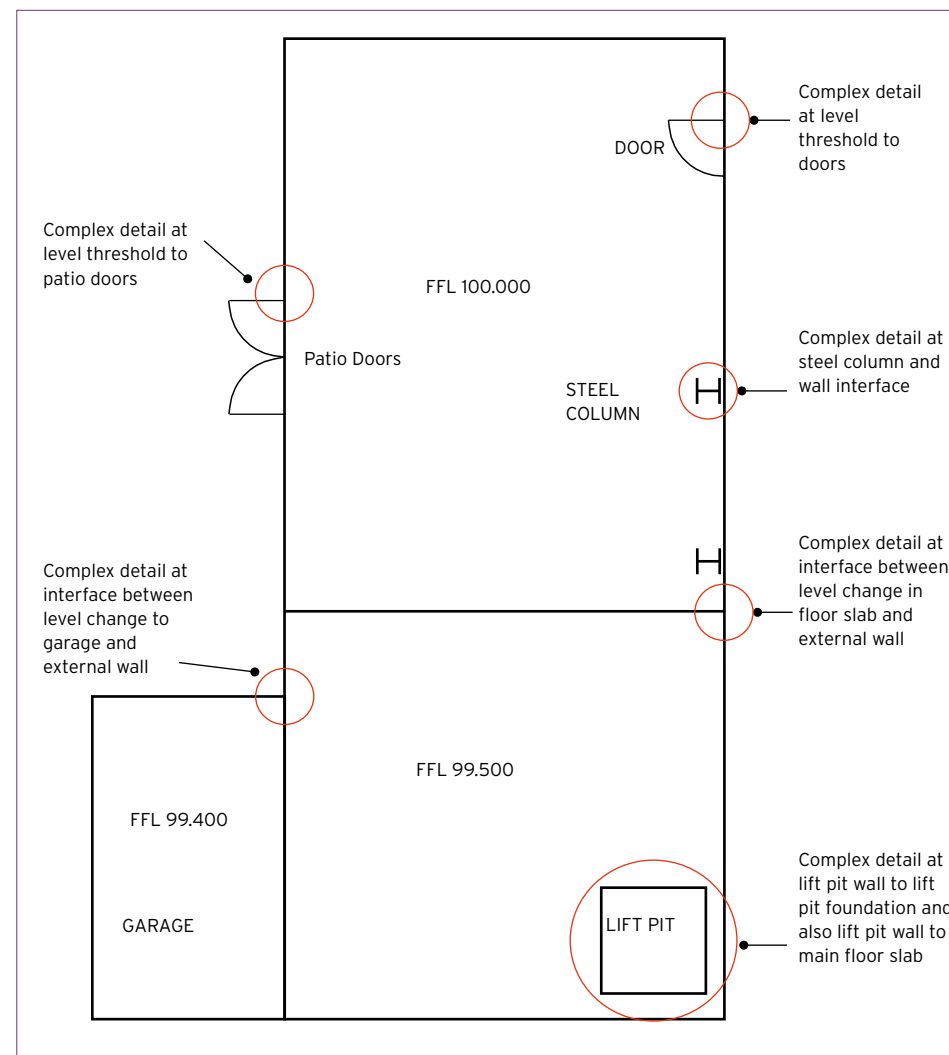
Common locations where 3D details are necessary and careful co-ordination of installation is required
